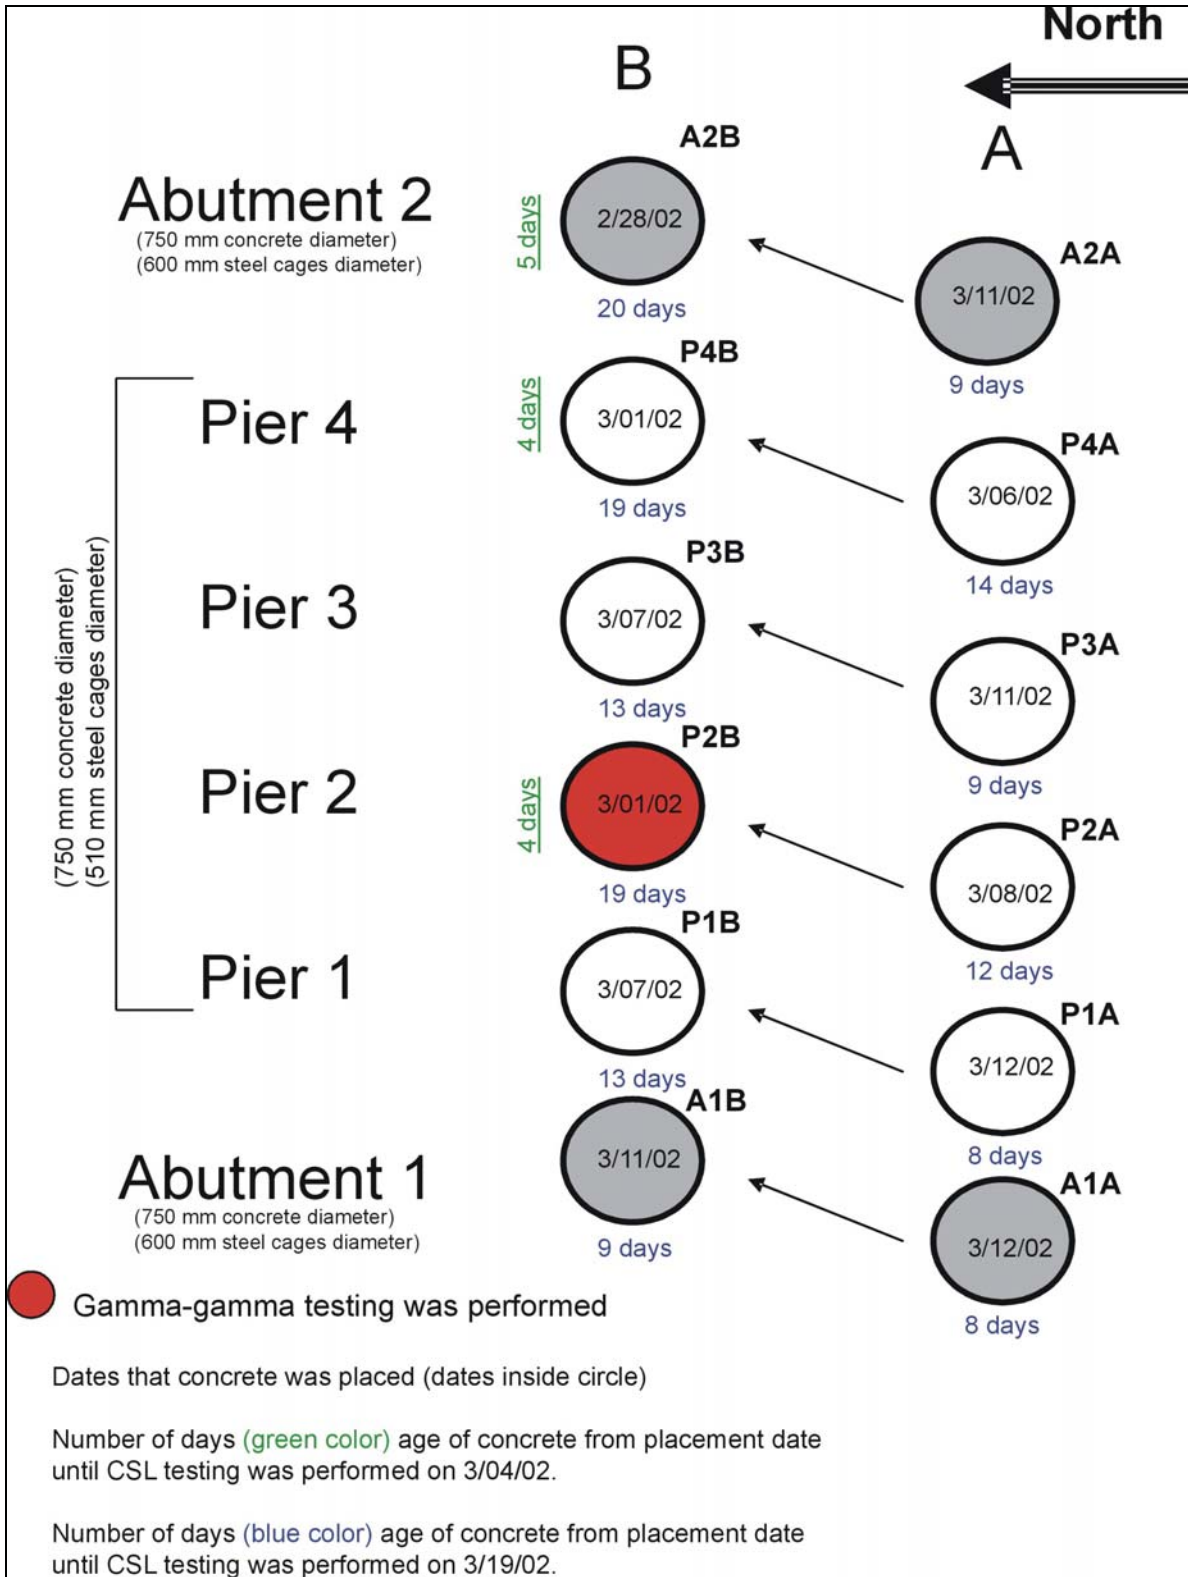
Schematic. Plan View of the Drilled Shafts at the Jim Camp Bridge, AZ.
